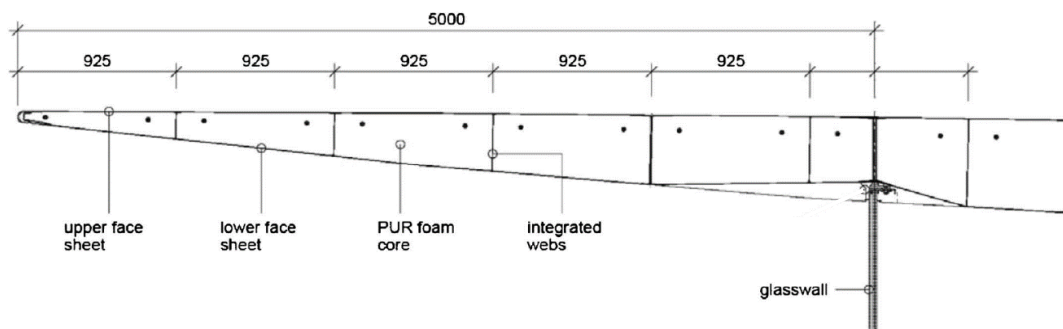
Hybrid GFRP sandwich roof panel (Keller, Haas, & Vallee, 2008).
